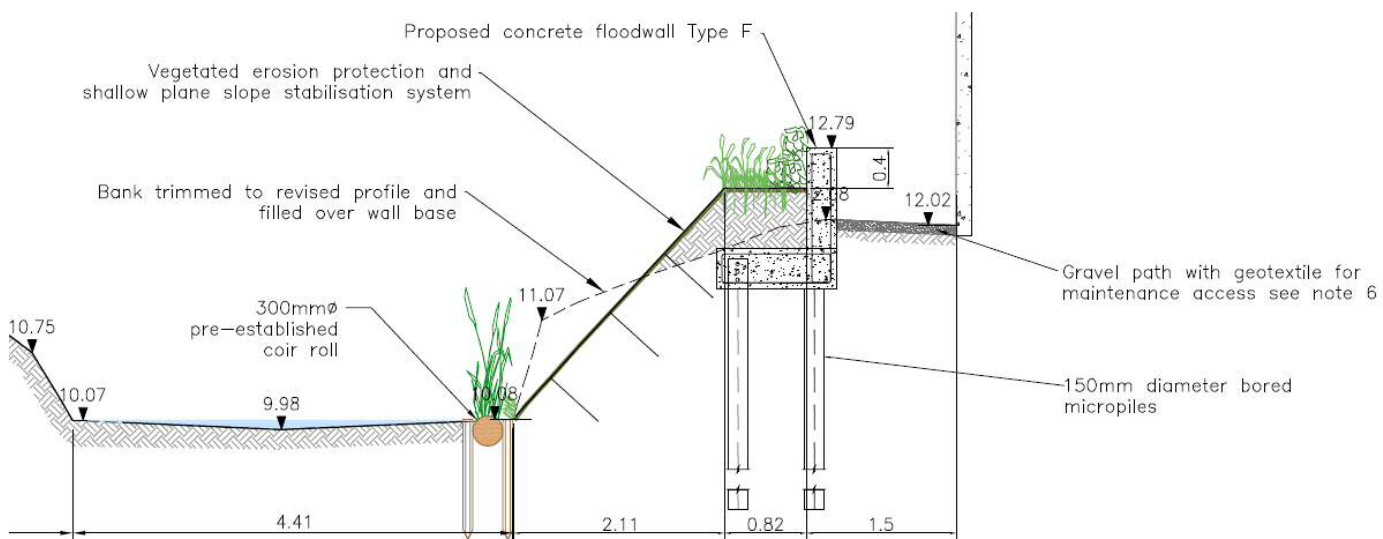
Cross section F-F – Reinforced Flood Bank with Piled 'Type F' Flood Wall
